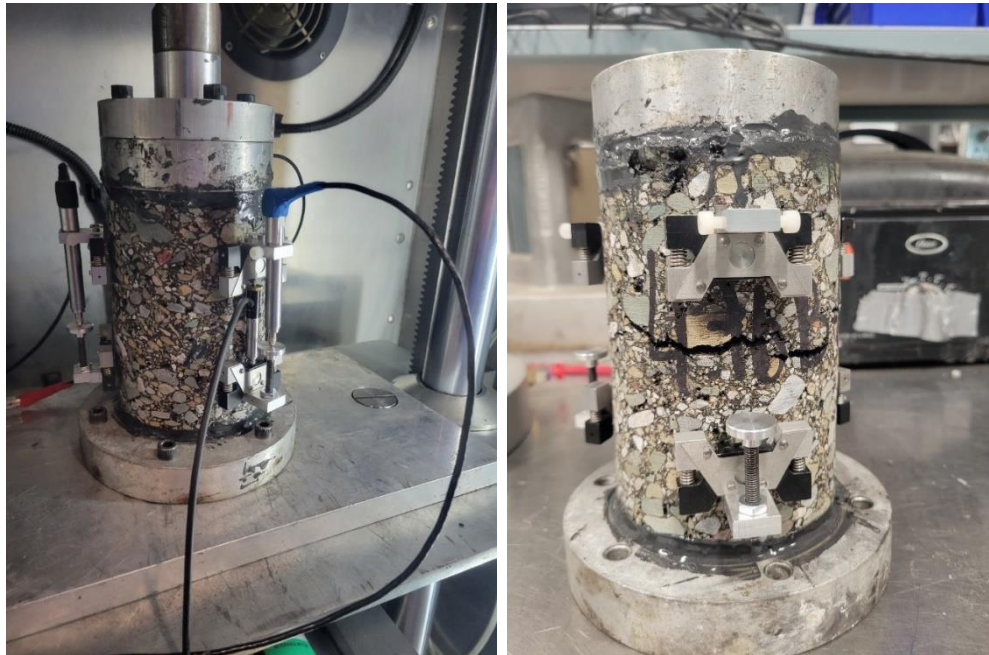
UTM-ramp test specimen before testing (left) and specimen cracked after testing (right).
